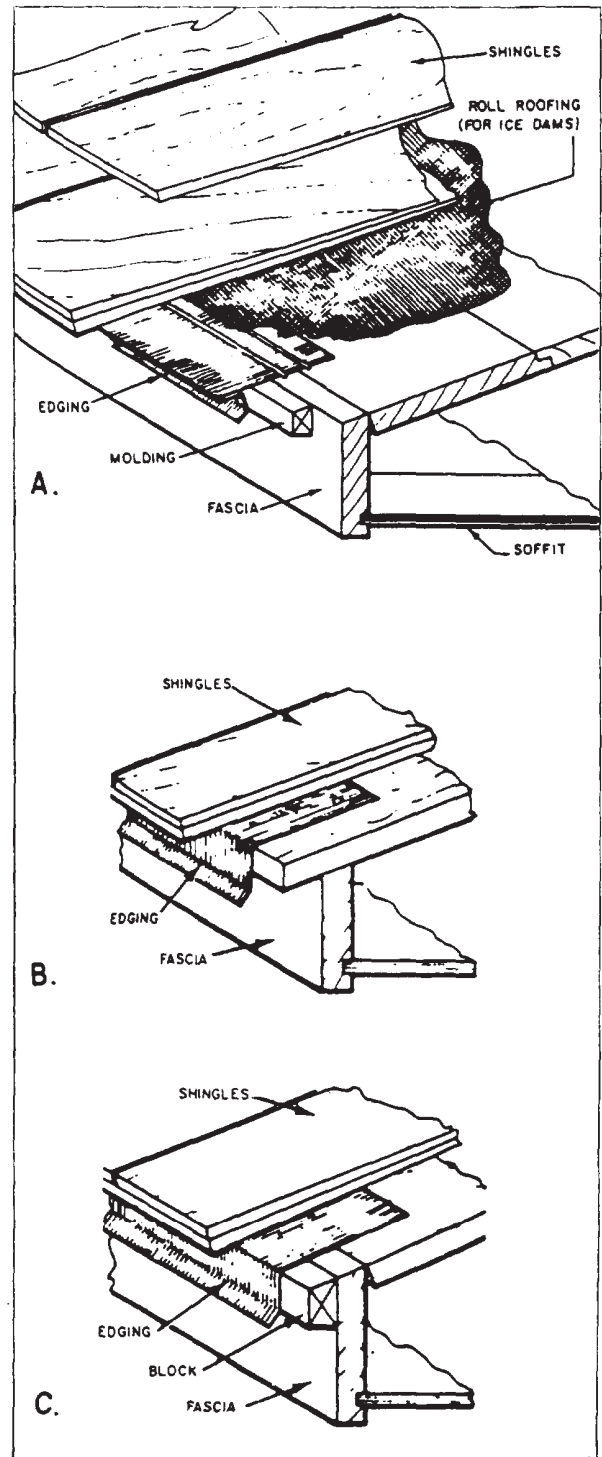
Cornice flashing: A. Formed flashing; B. Flashing without wood blocking; C. Flashing with wood blocking.
